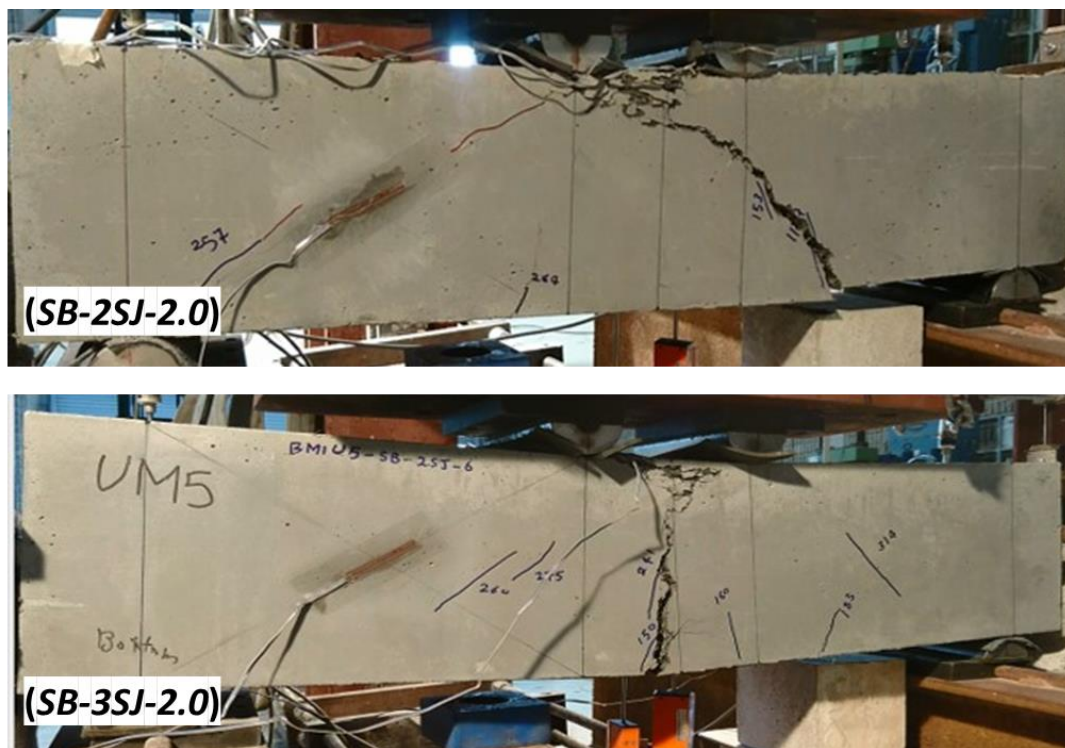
Failure modes of retrofitted beams (SB-2SJ-2.0) and (SB-3SJ-2.0)
